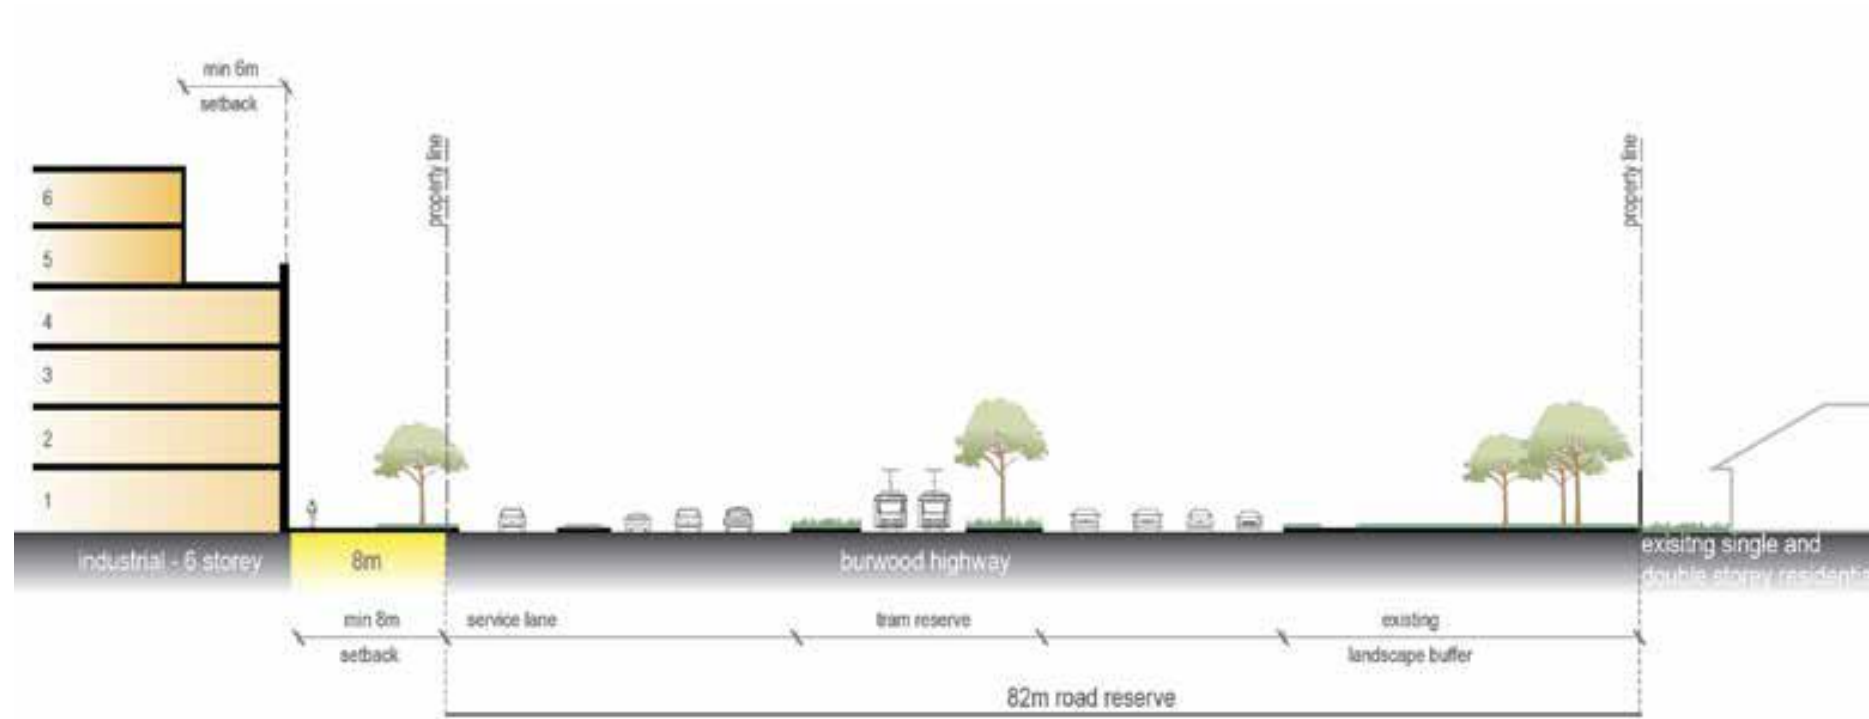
Section Diagram Lewis Road Industry Burwood Highway Interface (section e)
